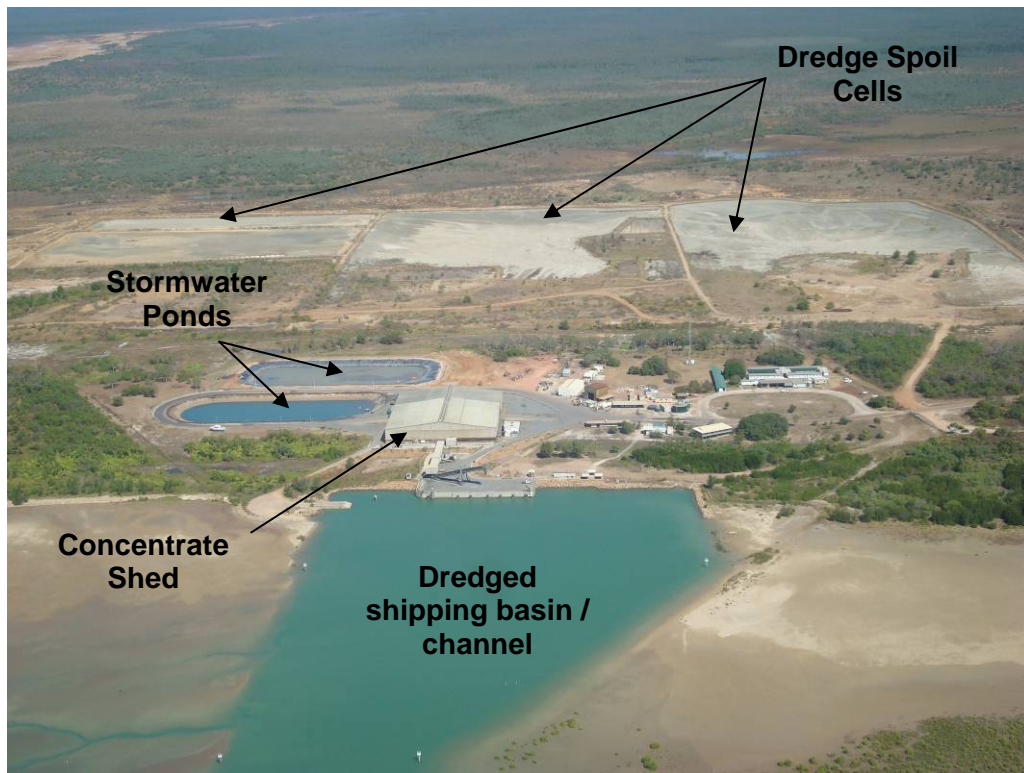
Aerial view of the Bing Pong Port facilities, facing south west. Photo: Independent Monitor
